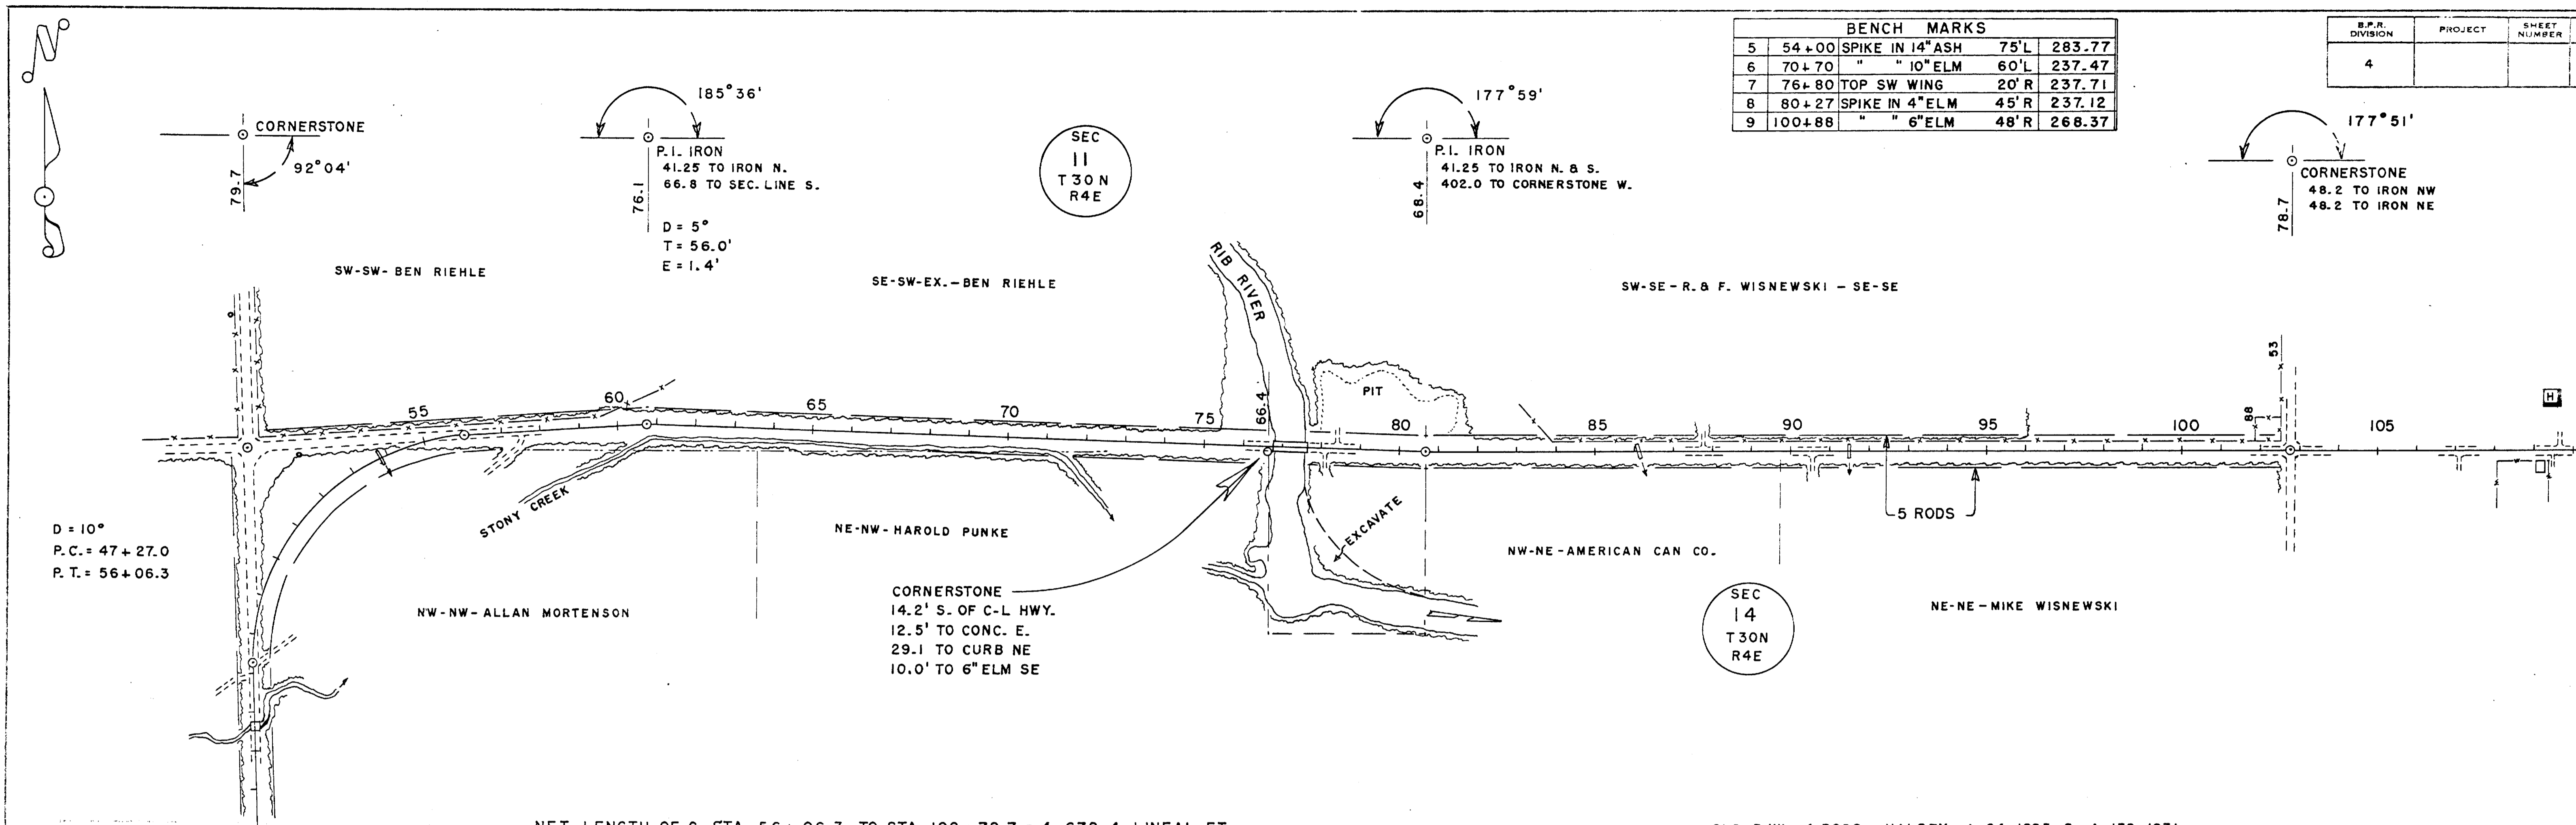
PLAN PROFILE (P. 3 STANDARD)
